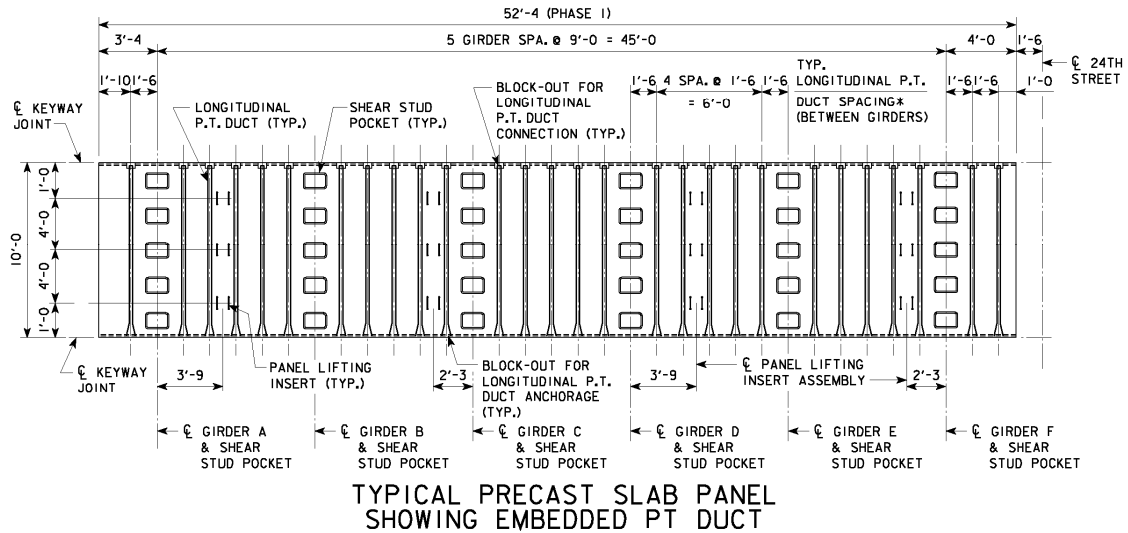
Typical Precast Slab Panel, Showing Embedded PT Duct
